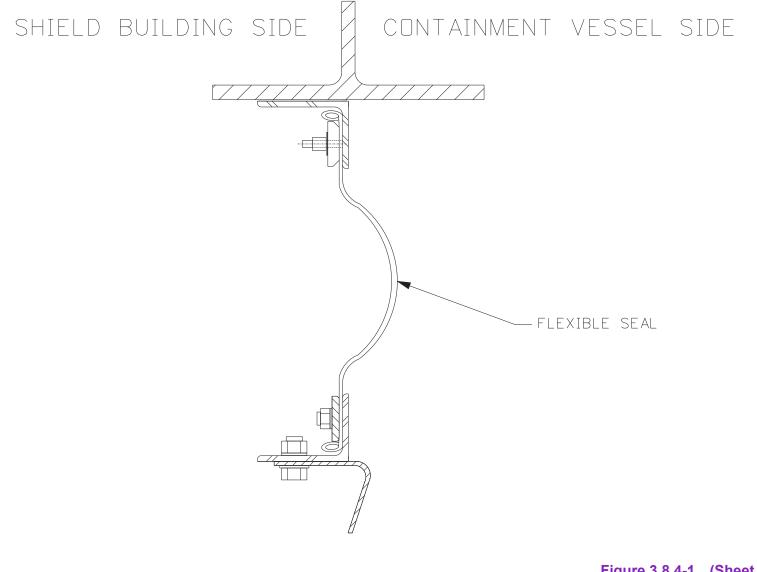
(Sheet 4 of 4) Containment Air Baffle Flexible Seal
